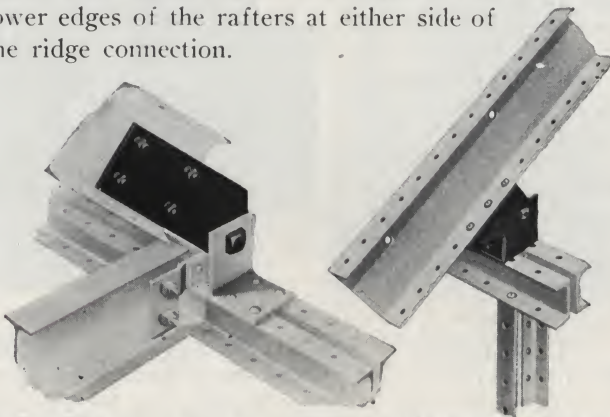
, Fig. 31. End Connections on Rafters Fastened with a Single Bolt (Forming a Hinge) to the Rafter Support
